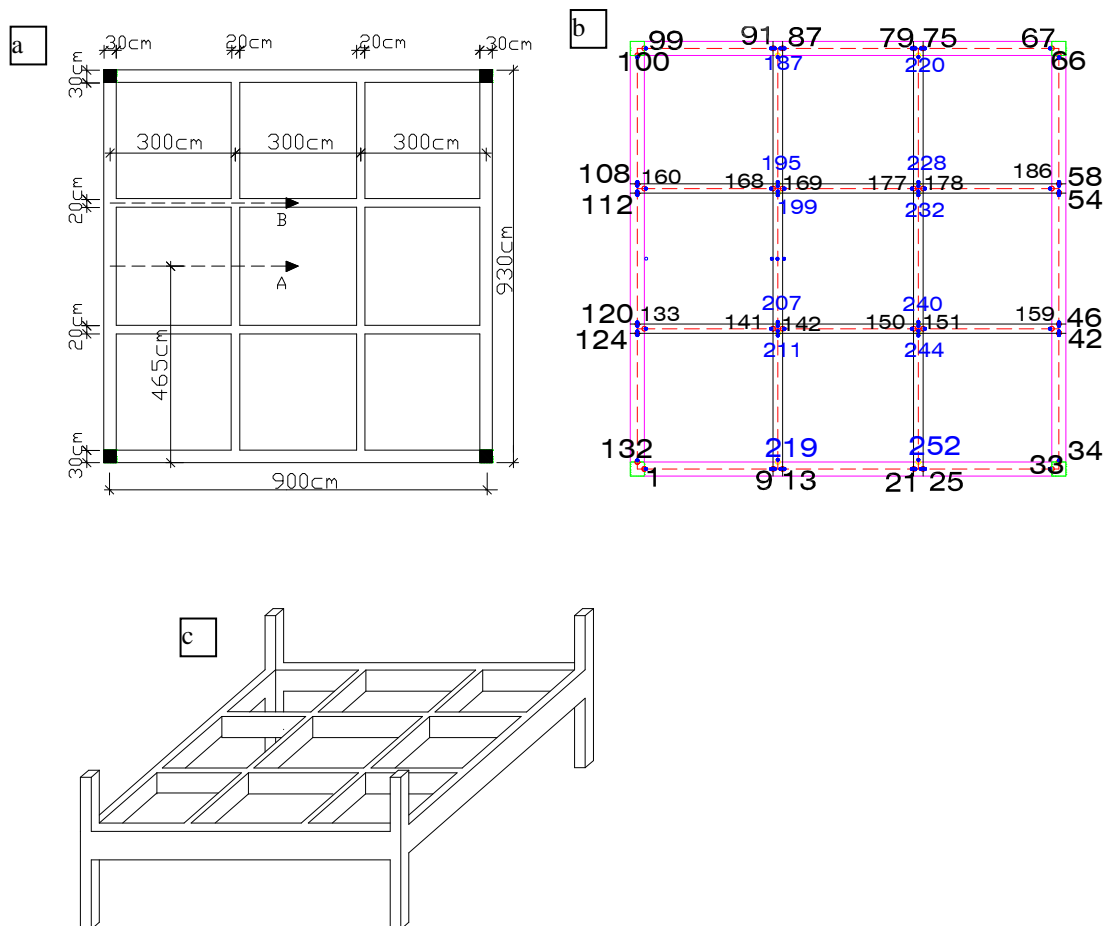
a) Plate middle surface view b) Plate discretization c) Building floor geometry
